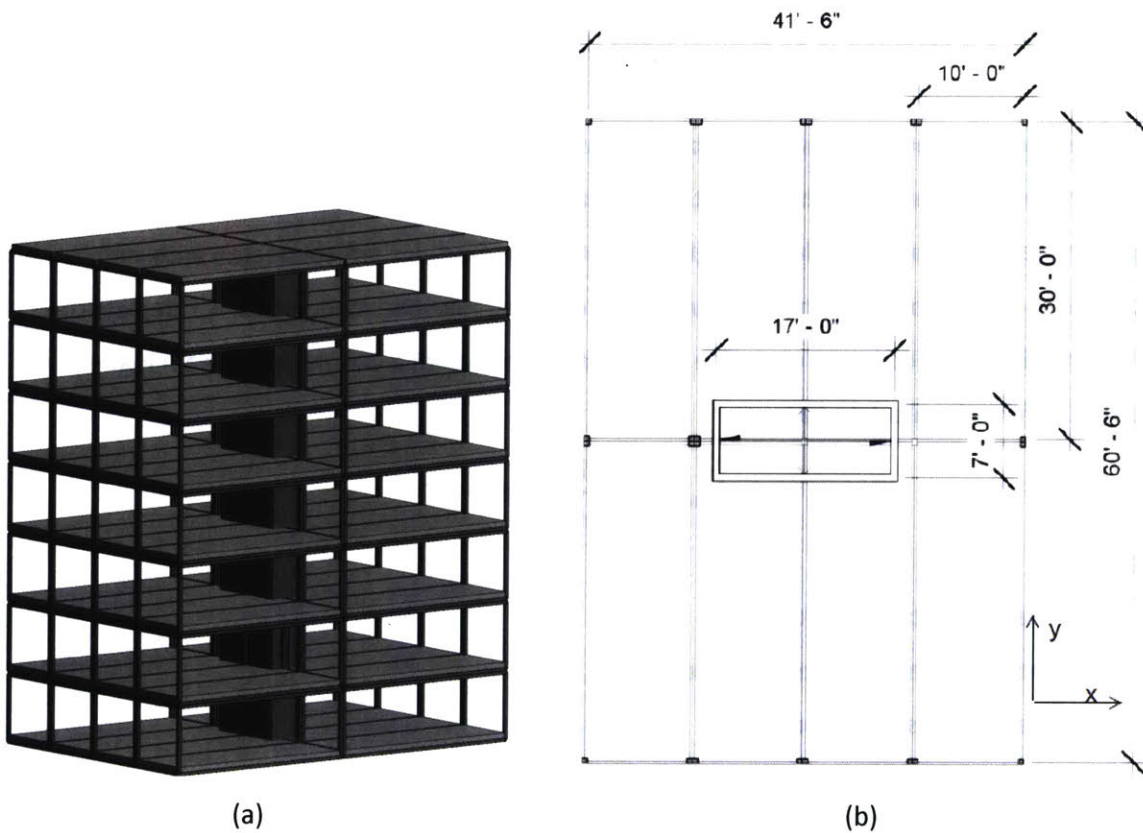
MODULAR BUILDING WITH CONCRETE CORE (A) ISOMETRIC VIEW (B) CORE DIMENSIONS
